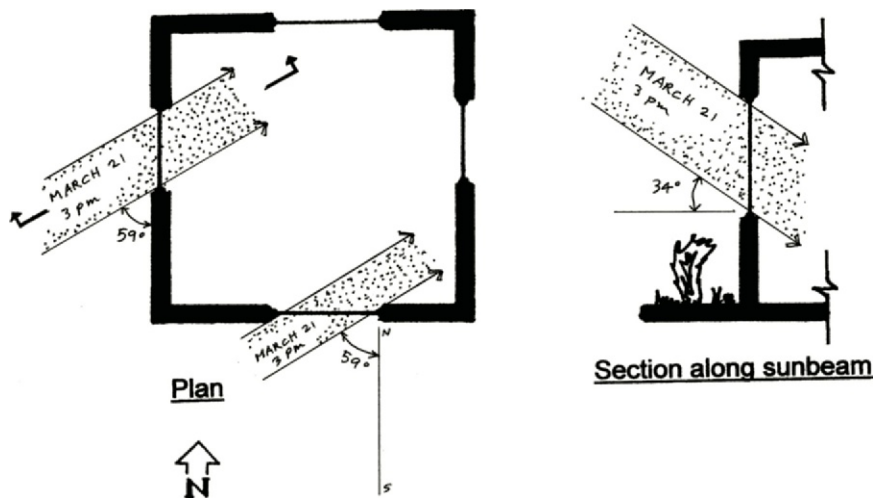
Azimuth angles are used to draw sunbeams in plan, and altitude angles are used in section. To prevent graphical distortion, the section is cut along the sunbeam, as can be seen on the west window in plan.
